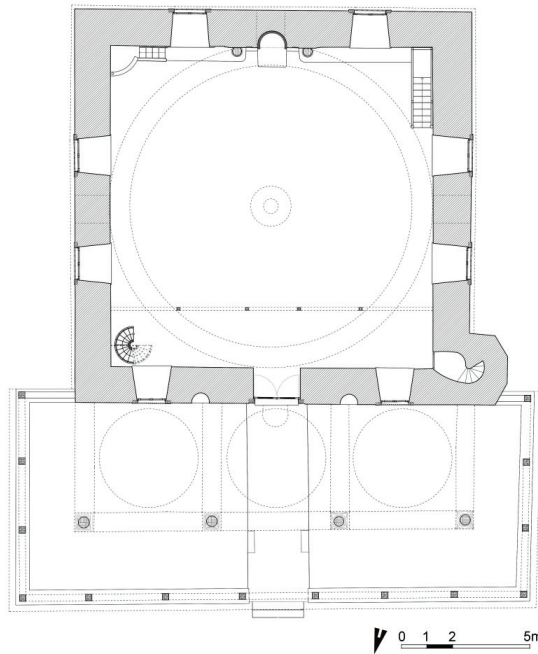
2nd restitution phase, roof plan. (Dares Architecture)
